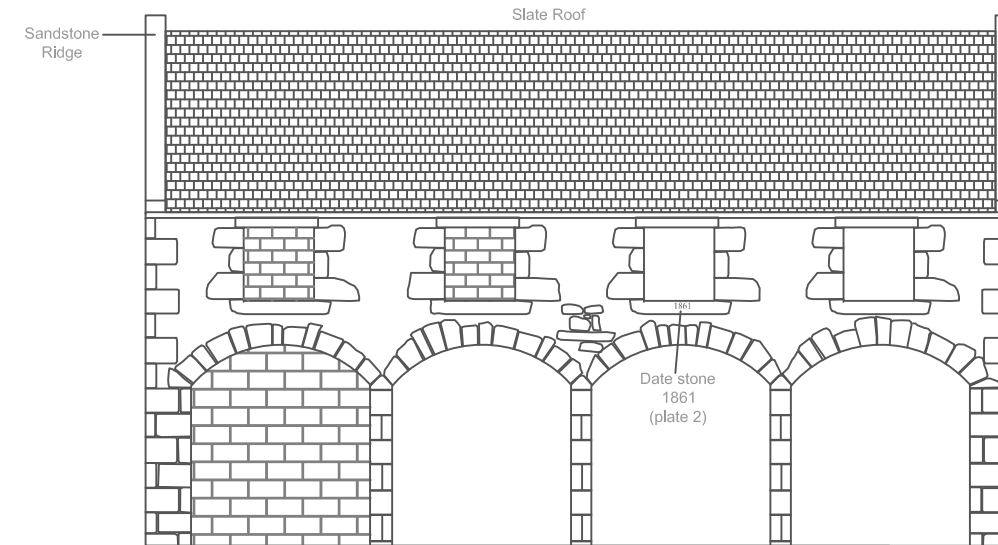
Building 1, Southwest-facing elevation (plate 1)
